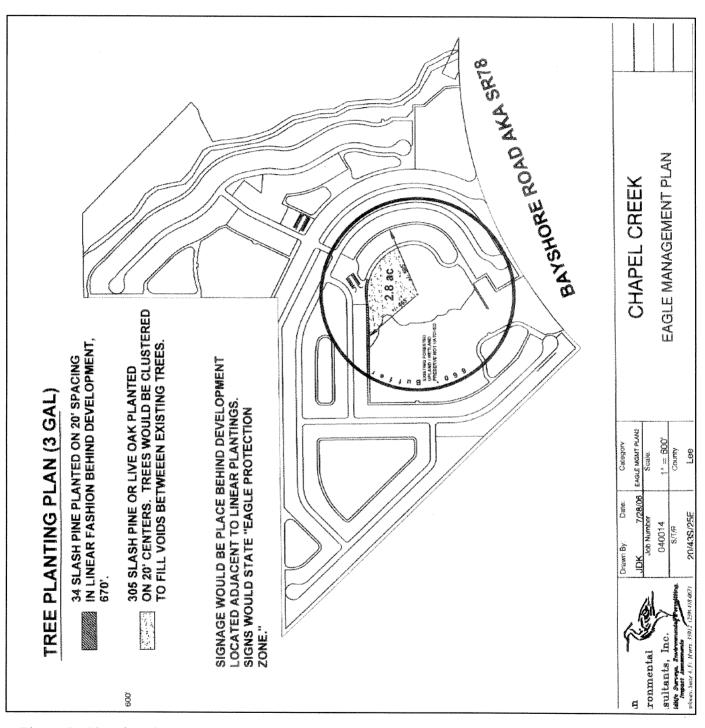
Site plan showing the location of the proposed project relative to the nest LE-068
